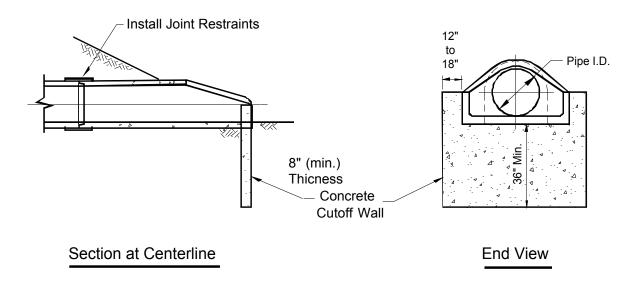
Concrete Flared End Section with Cutoff Wall for all Pipe Outlets
